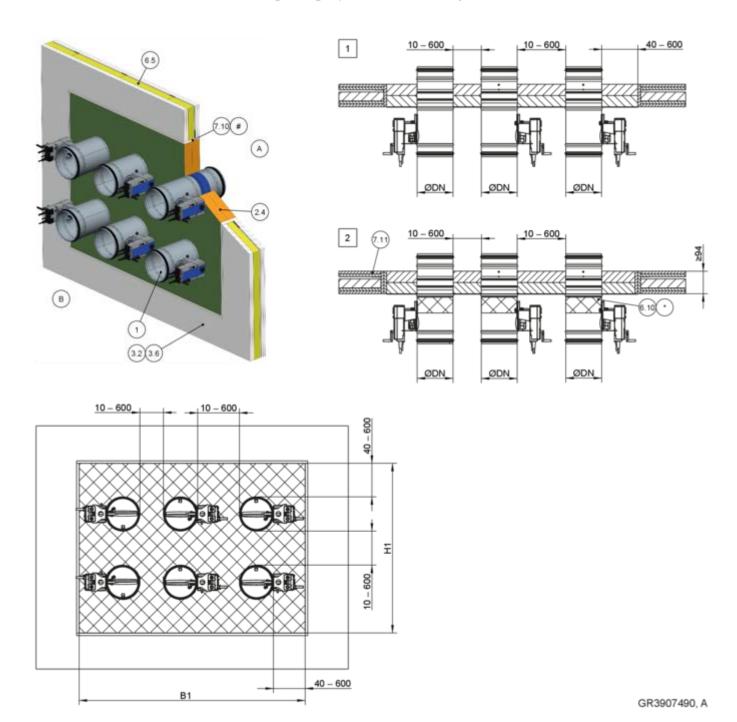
Dry mortarless installation with fire batt in lightweight partition wall – Multiple occupancy of an installation opening
